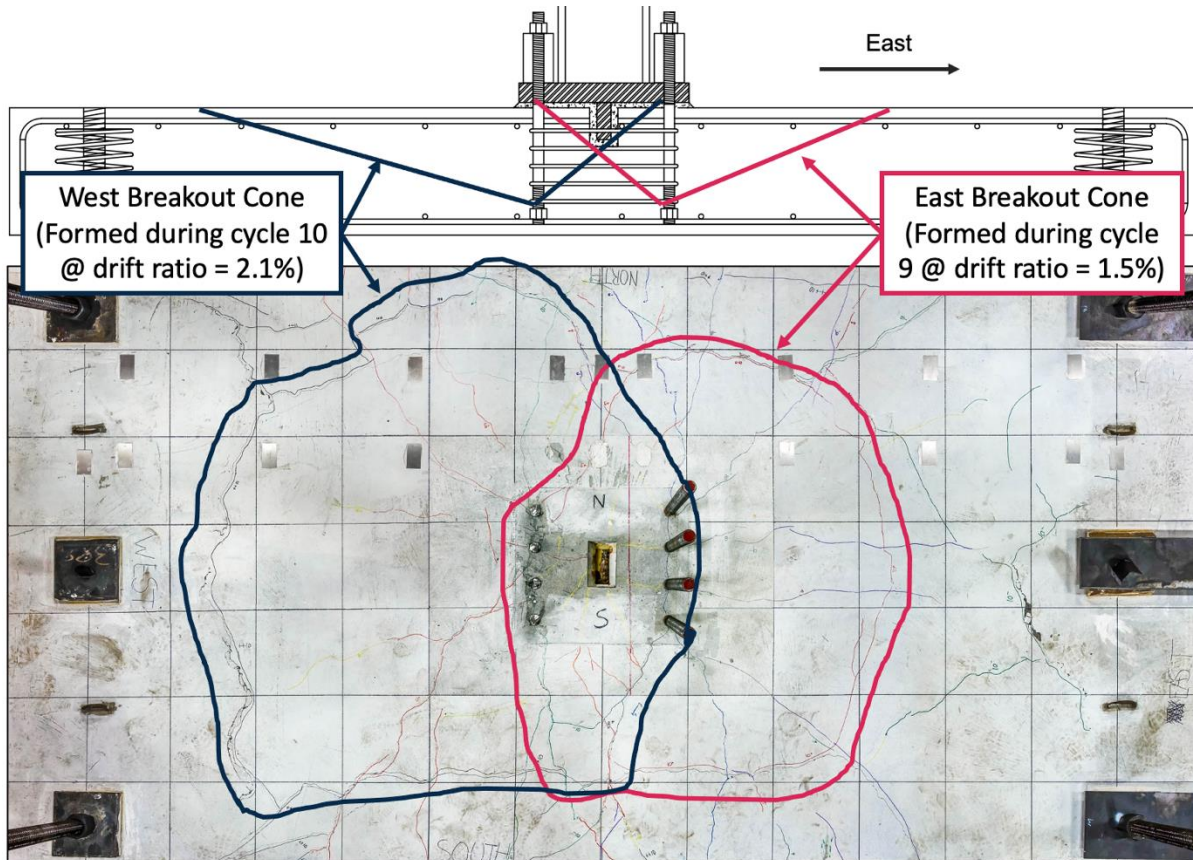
Idealized cone geometry shown in elevation and observed cone geometry intersecting top surface in plan view, with 12-in. x 12-in. [305 mm x 305 mm] grid specimen M01
